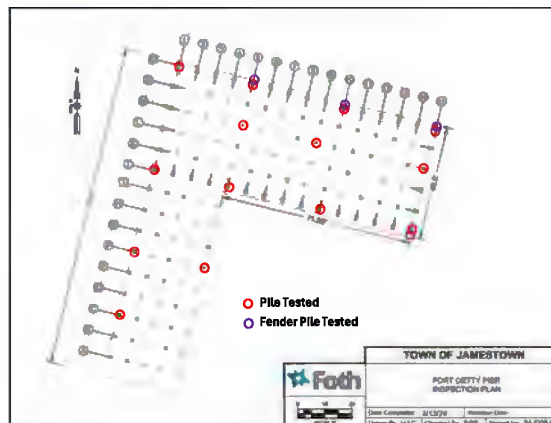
Inspection Plan for Fort Getty Pier with locations of piles test.
